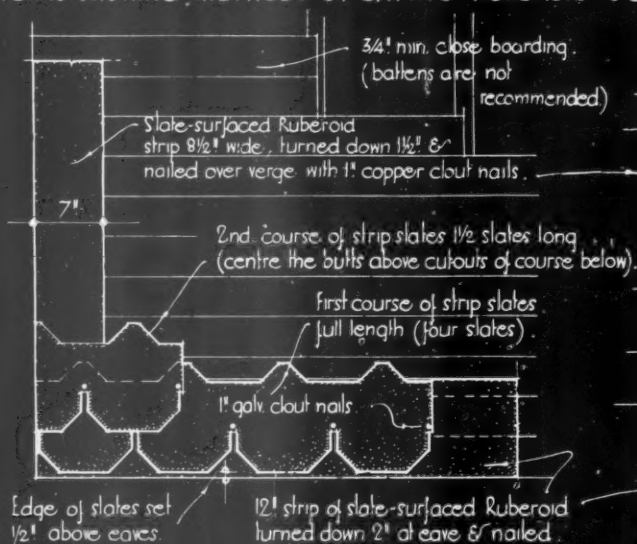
DETAILS OF RUBEROID (SLATE-SURFACED) STRIP ROOFING SLATES (for pitched or curved boarded roofs)
